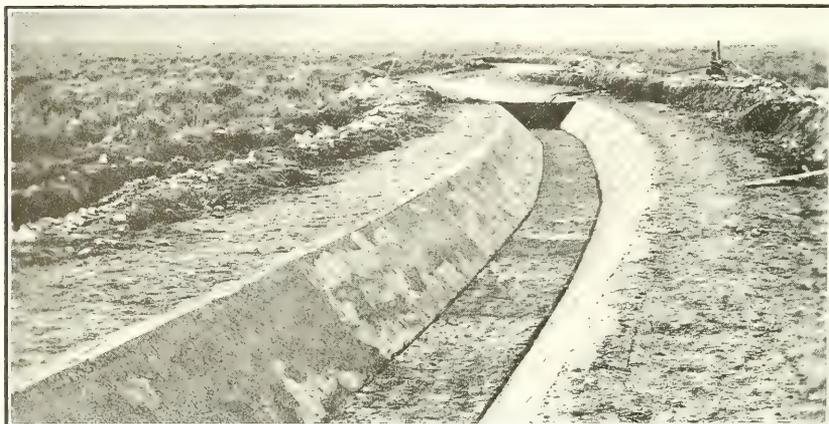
SECTION OF CONCRETE-LINED CANAL, NORTHERN PACIFIC IRRIGATION CO., KENNEWICK, WASH.
